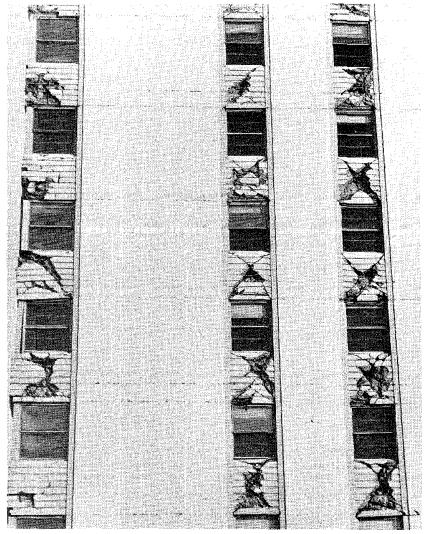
This 14-story, reinforced-concrete apartment building in Anchorage, Alaska was damaged by the vibrations produced by the 1964 Alaska earthquake (M8.4). There were no recording instruments in the building, nor were there strong-motion instruments in Alaska at that time. (Photo by George W. Housner)
